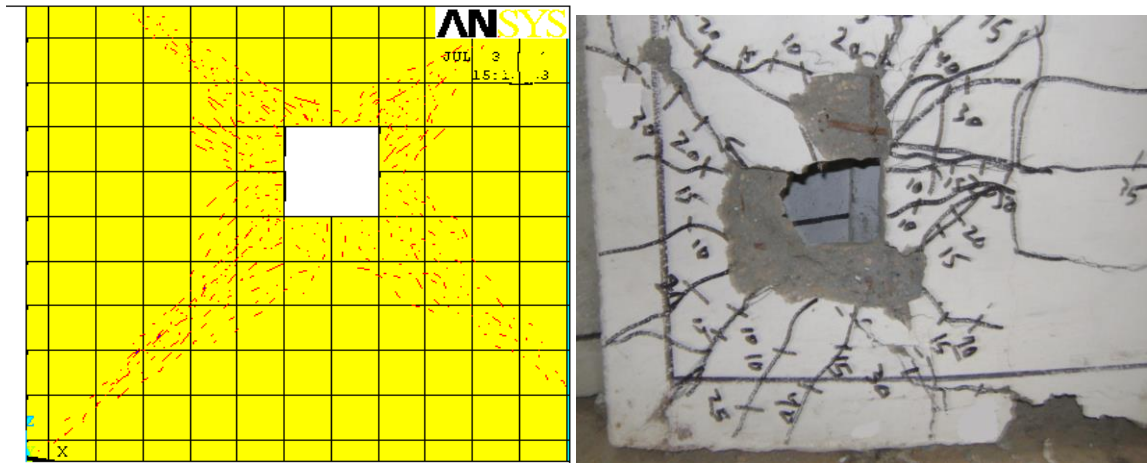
Cracking pattern around the opening in bottom face of slab (B-1).
